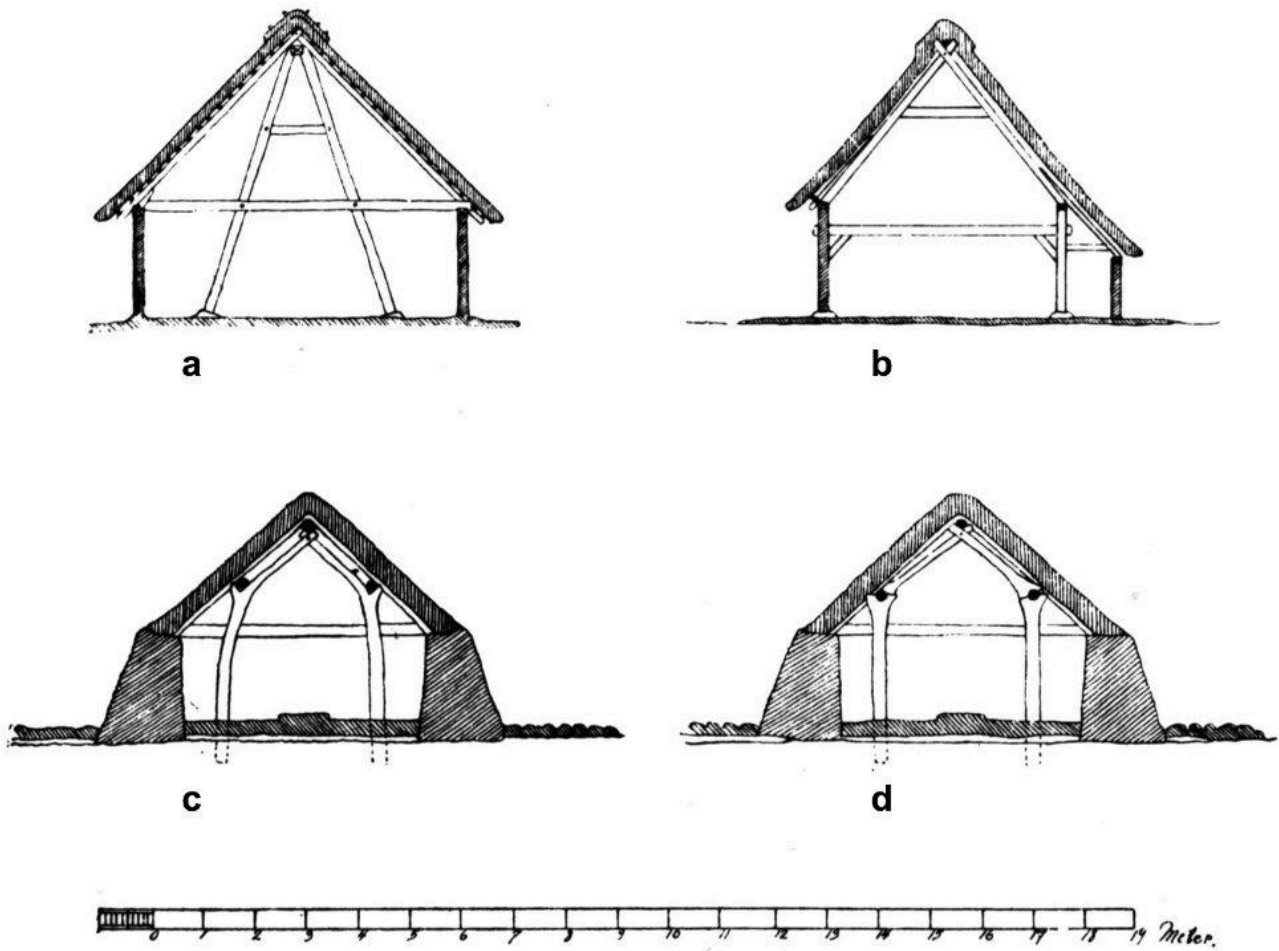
DRAWINGS OF TWO RECENT HOUSES IN JUTLAND, A: WITH RAKING POSTS CARRYING THE CENTRAL RIDGE AND B: A HALF-TIMBERED HOUSE WITH LEAN-TOS, USED AS PROTOTYPES FOR C-D: RECONSTRUCTED CROSS-SECTIONS OF AN EARLY IRON AGE HOUSES WITH SOD WALLS AND ROOF (AFTER ZANGENBERG 1930)
